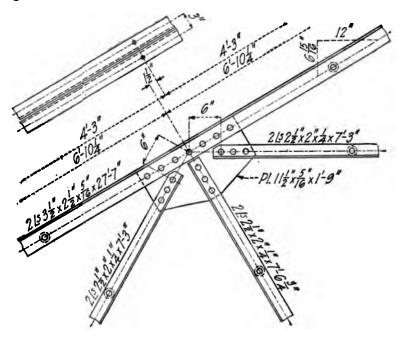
JOINT OF ROOF TRUSS, "SKETCH" DETAILED.
